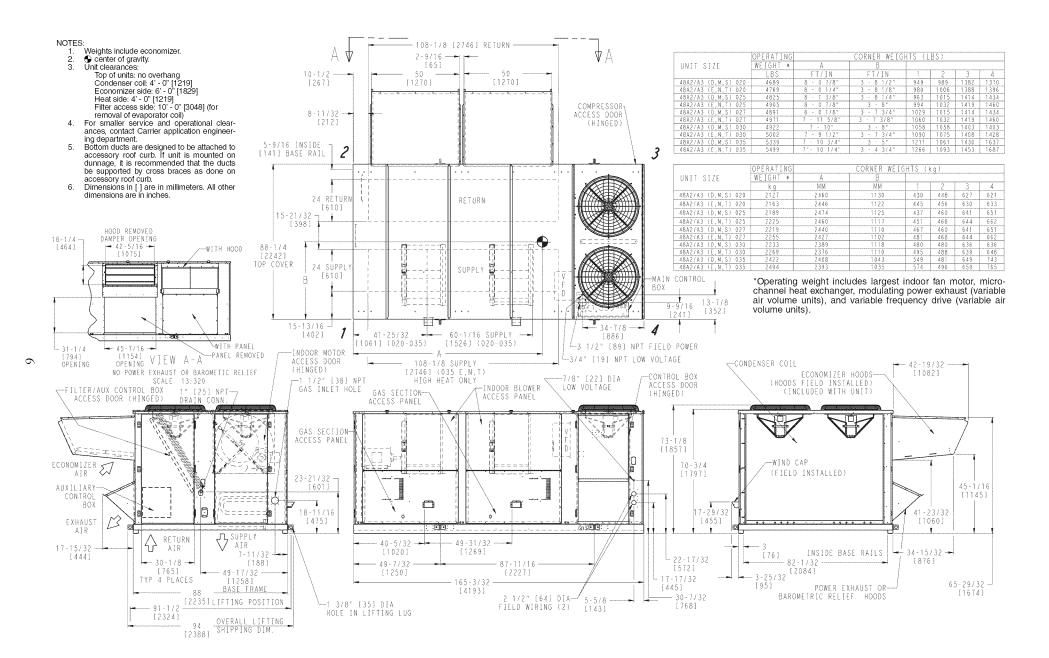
Base Unit Dimensions — 48A2,A3020-035
